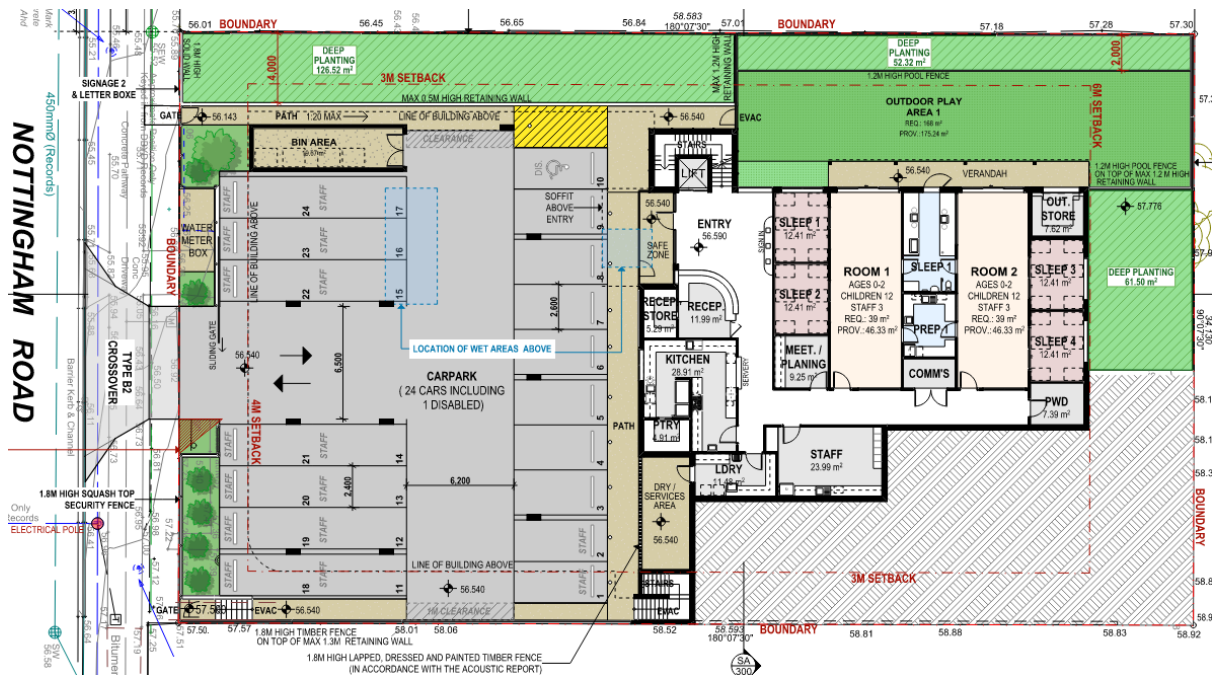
Proposed revised Ground Floor Plan indicating extent of deep planting adjacent to the western side boundary to ensure Trees #1 to #11 are protected and retained upon redevelopment.
